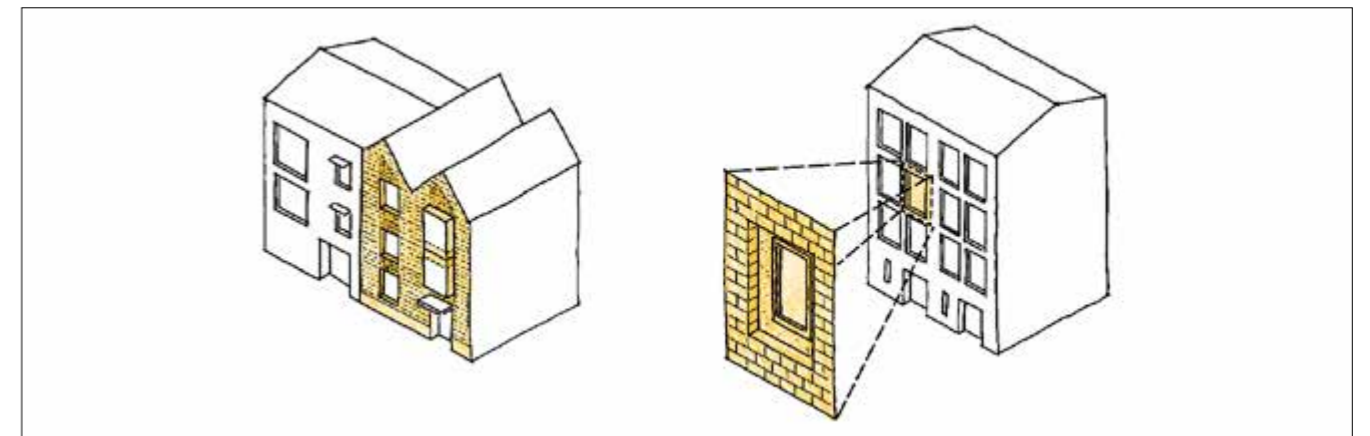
Including interesting details will ensure that buildings are attractive from a distance and close up
